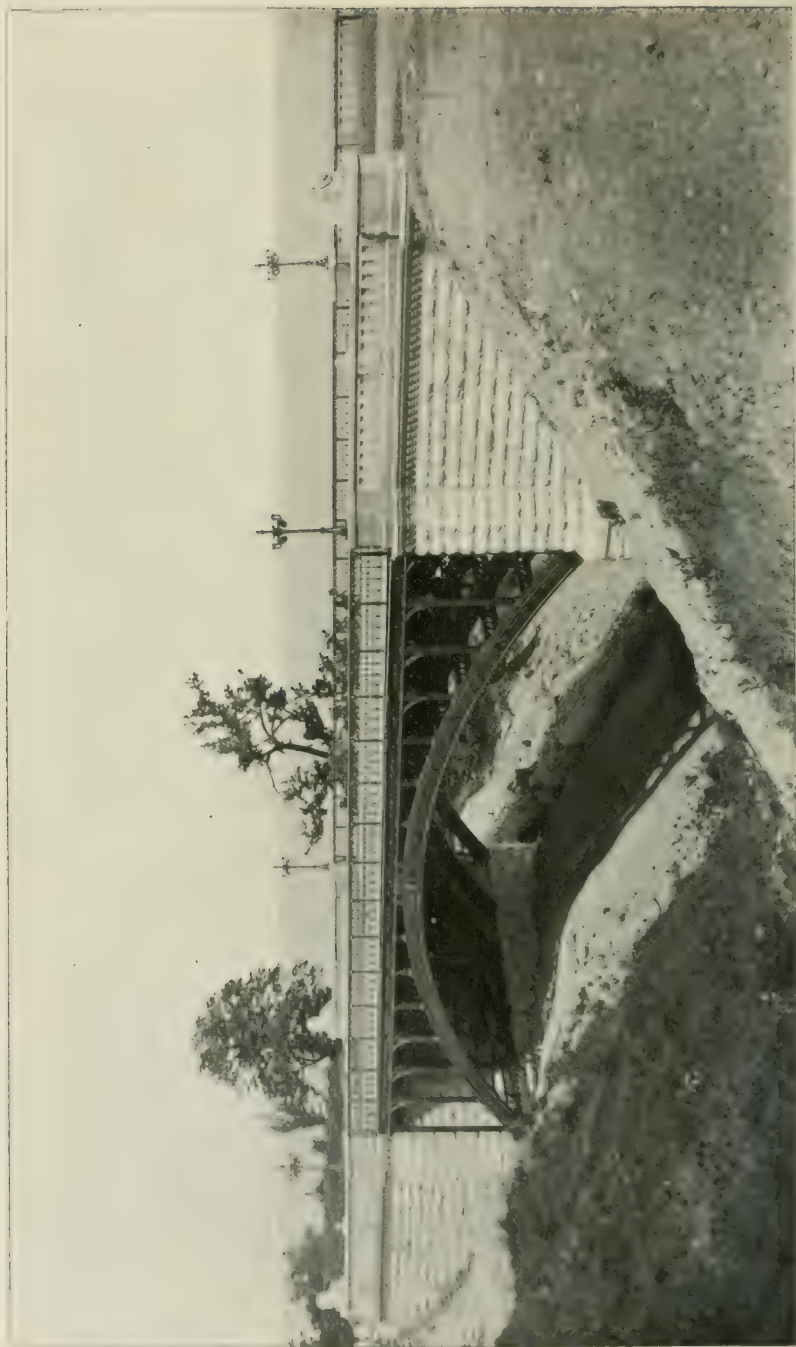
87 FOOT STEEL ARCH BRIDGE IN LAKE PARK.
